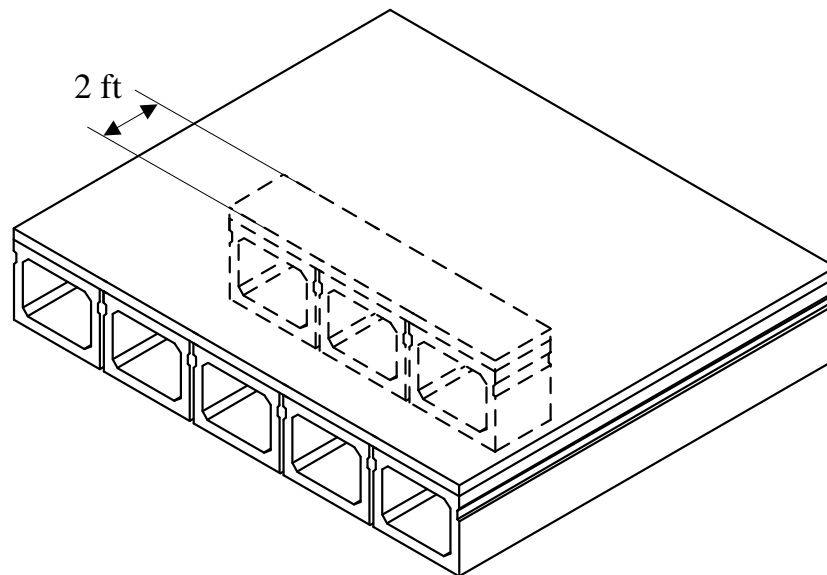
Full scale bridge (FSB) model with truck loads and beams of interest demarcated.
